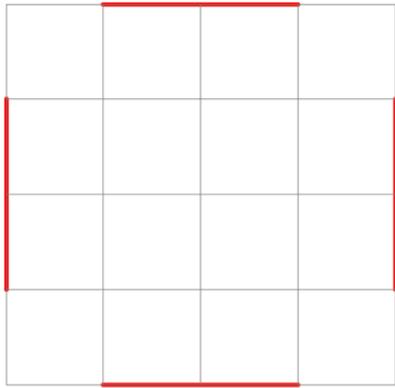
(a) Structural Plan for Inverted V-braced RC Frame (Model-4)
